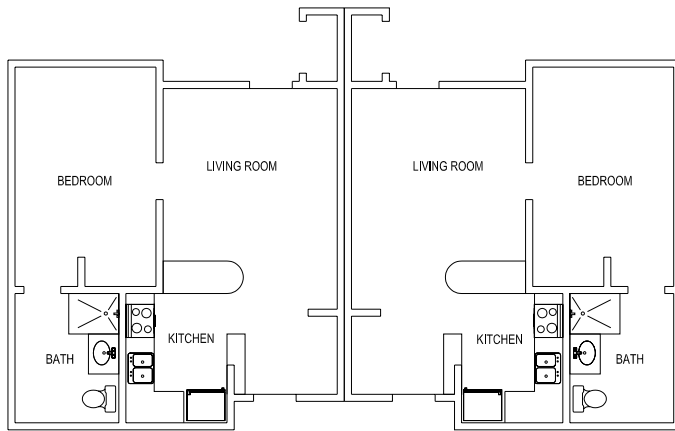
House #4 – Apartment Floor Plan (two units shown)
